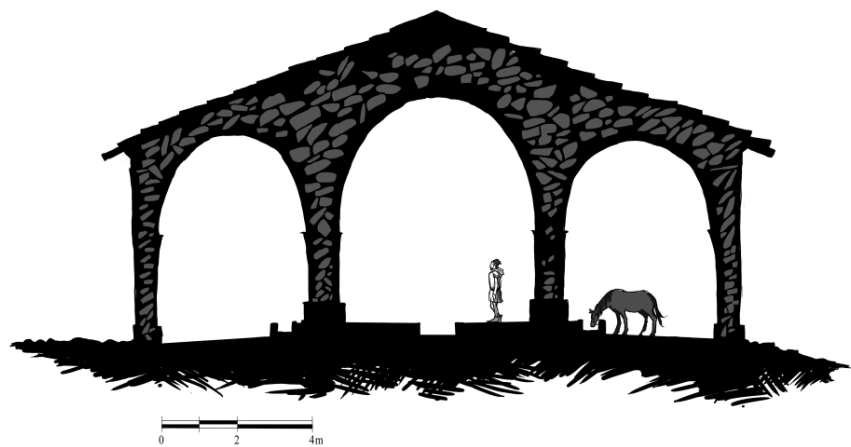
Scale reconstructed longitudinal cross-section of the Arai-Bazarjugh caravanatun, as viewed from the south.
